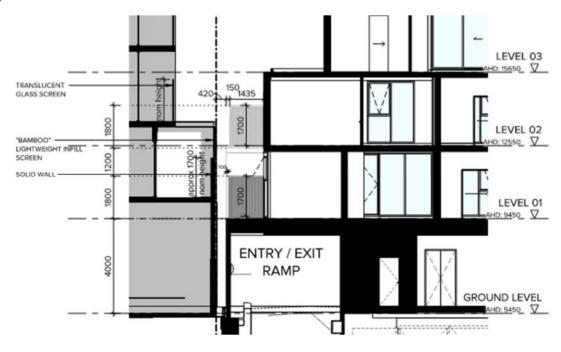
Northern elevation of No. 7 Brighton Road - including screening to first floor balconies
